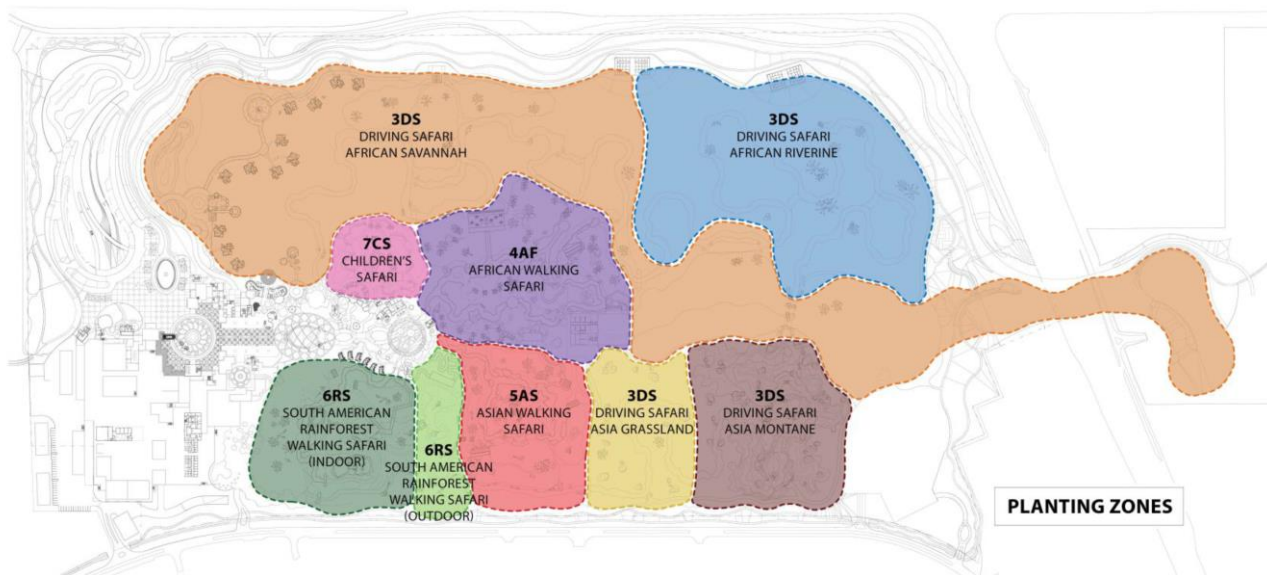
Exhibit Planting Zones Plan of the New Doha Zoo
